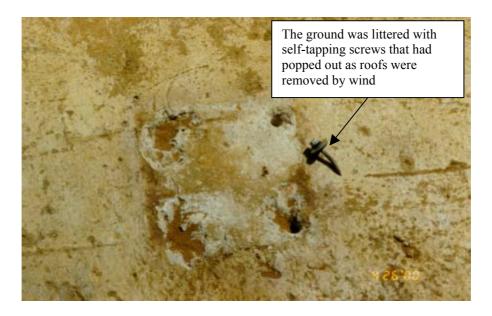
Concrete footing, Echo Beach – timber stumps pulled out in high winds
